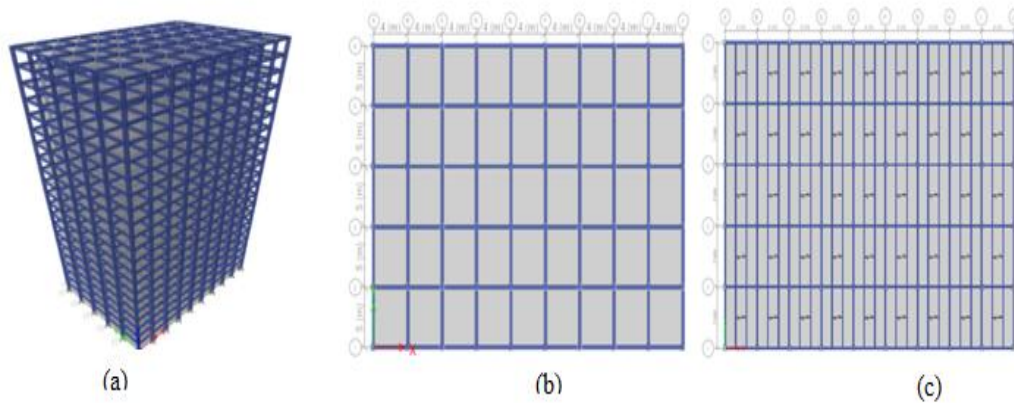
(a) Elevation Of Model; (b) Plan Of R.C.C. Model; (c) Plan Of Steel, Composite Structure
